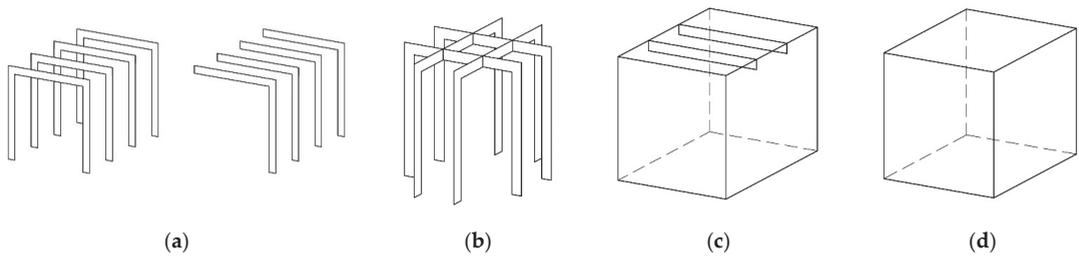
Typology of glass structural systems used in all-glass objects: (a) frames; (b) grillages; (c) beam-wall systems; and (d) plate-wall systems (figures by the author).
